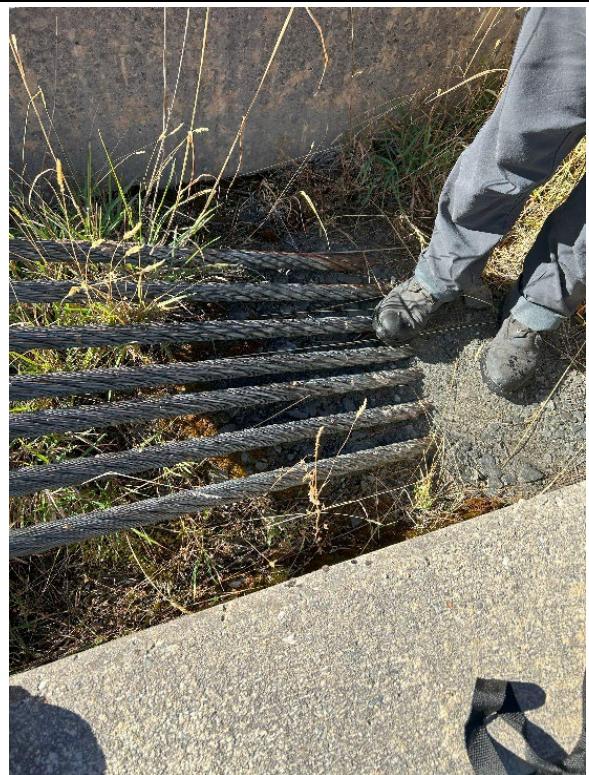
Cables entering anchorage concrete on the TL upstream anchorage. Also localised corrosion here
